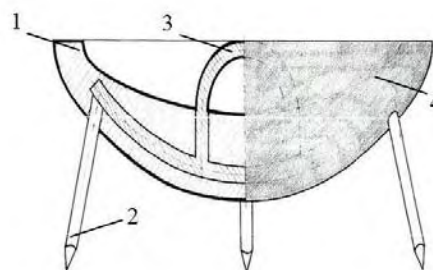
Construction scheme of anchor (1 - heavy concrete body, 2 – metal pine, 3 – metal ring, 4 – rubber cover).
